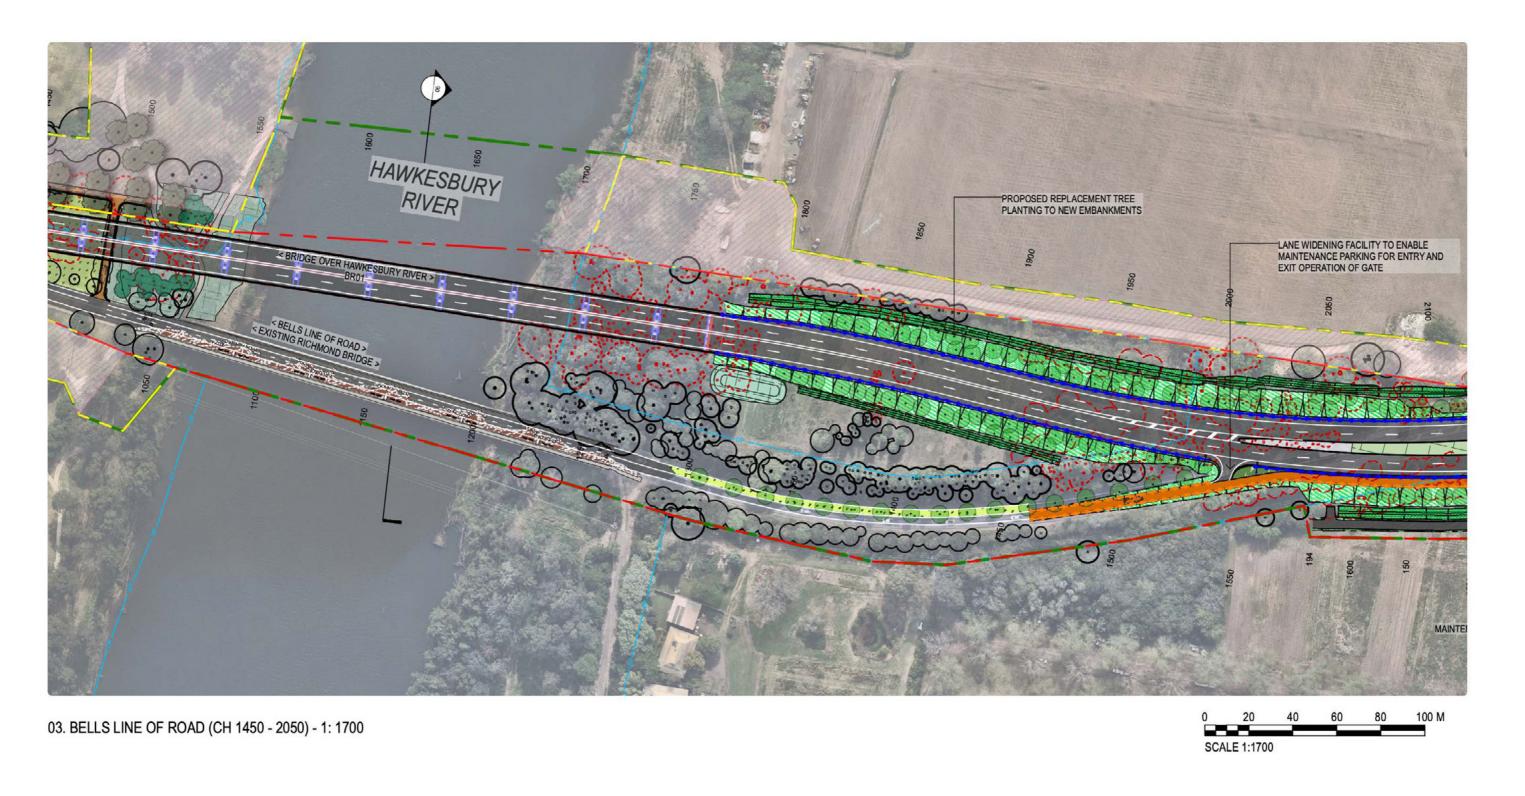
Stage 2A urban design plans - sheet 3 of 7
